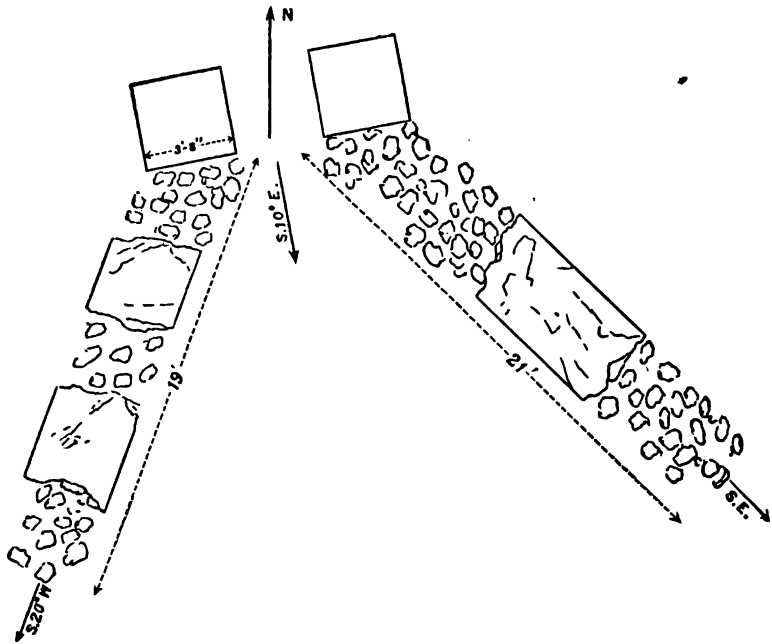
Plan of overturned gate pillars at entrance to Inglis' house, Cherrapunji.
